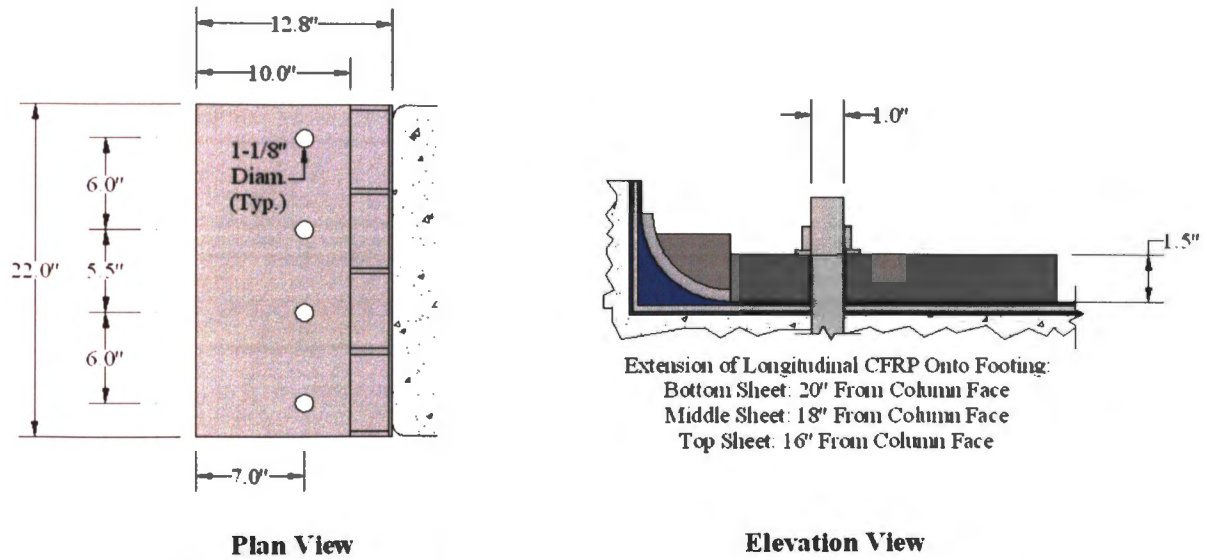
Final Details of Novel Anchorage System For Column #1
